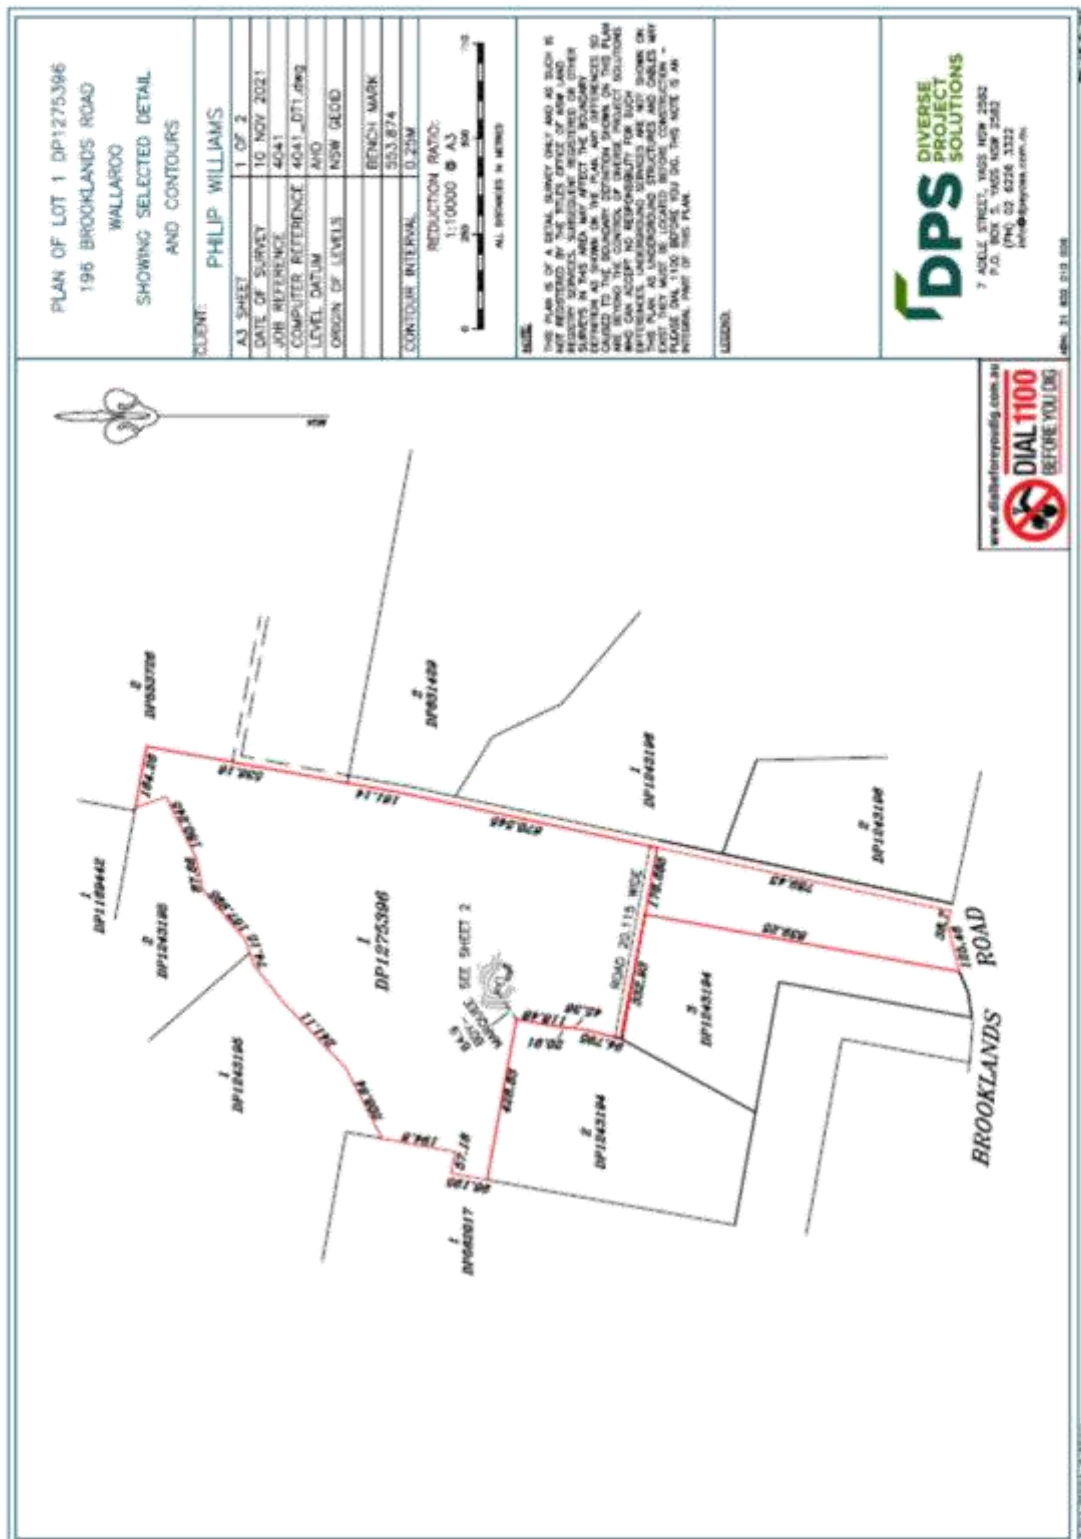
Sheet 1 of Proposed Site Plan (Source: DPS, November 2021)
